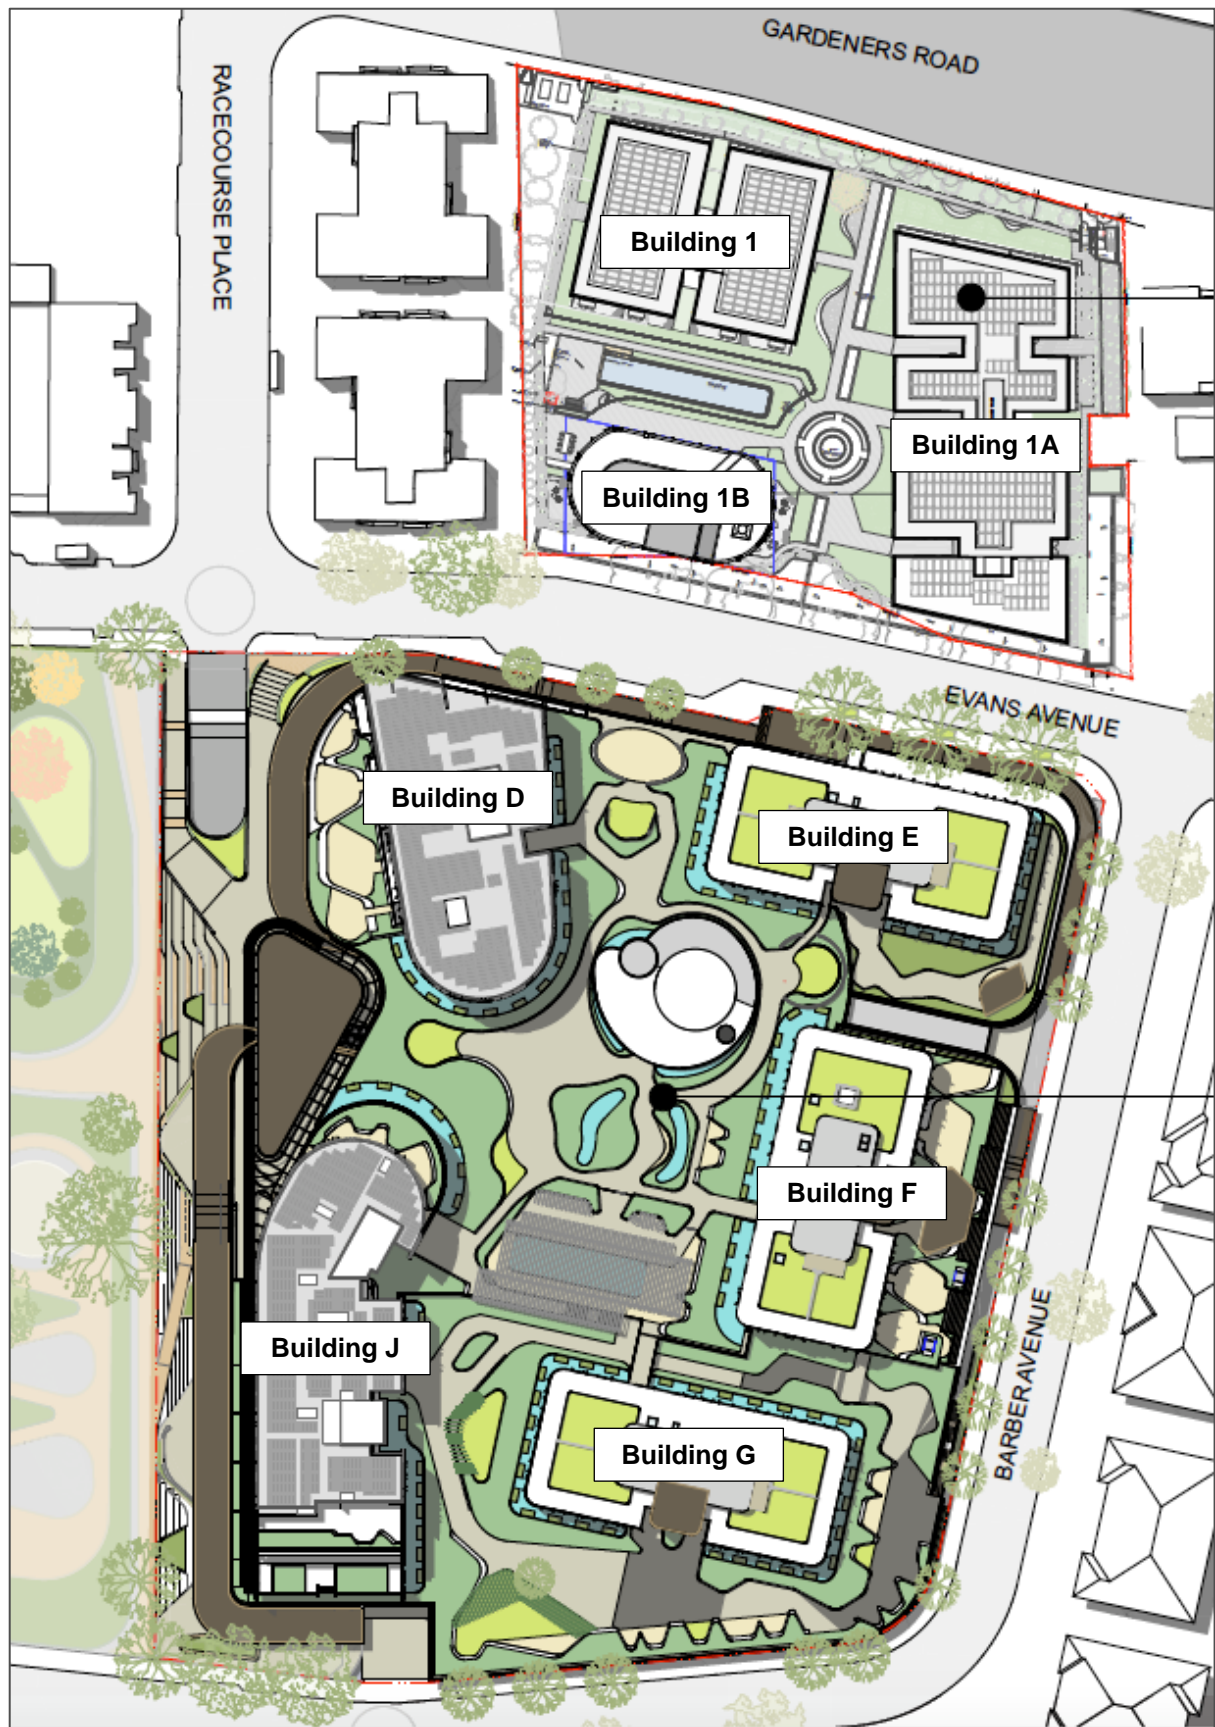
| Proposed site layout (Source: Proponent's SRtS)
